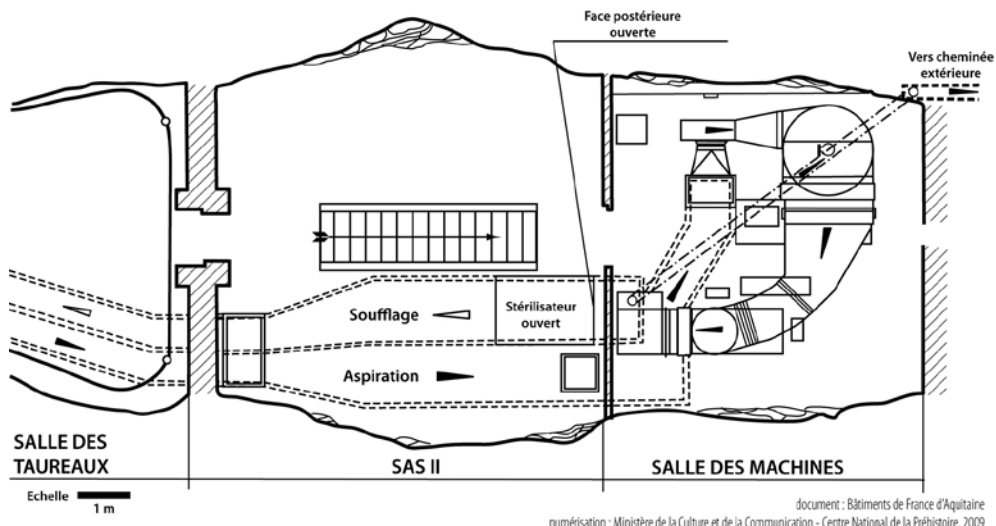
Plan of the machine installed in Lascaux cave in 1957- 1958. © MCC-STAP24
